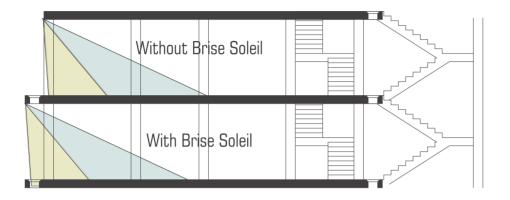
Section of building indicating sun angles and floors with and without brise soleil (by Author)
